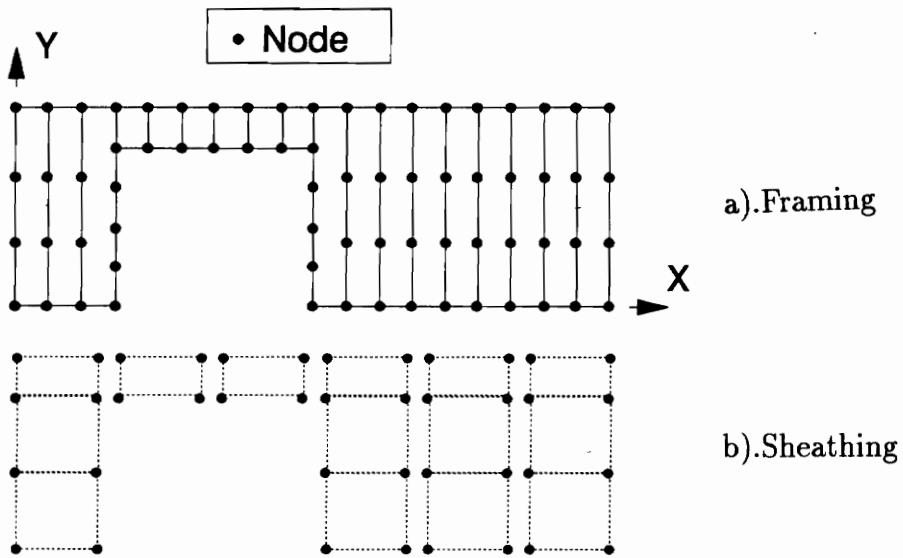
Configuration of 2.4 m (8 ft) High Shear Wall Model with 2.4 m (8 ft) Long Door Opening
